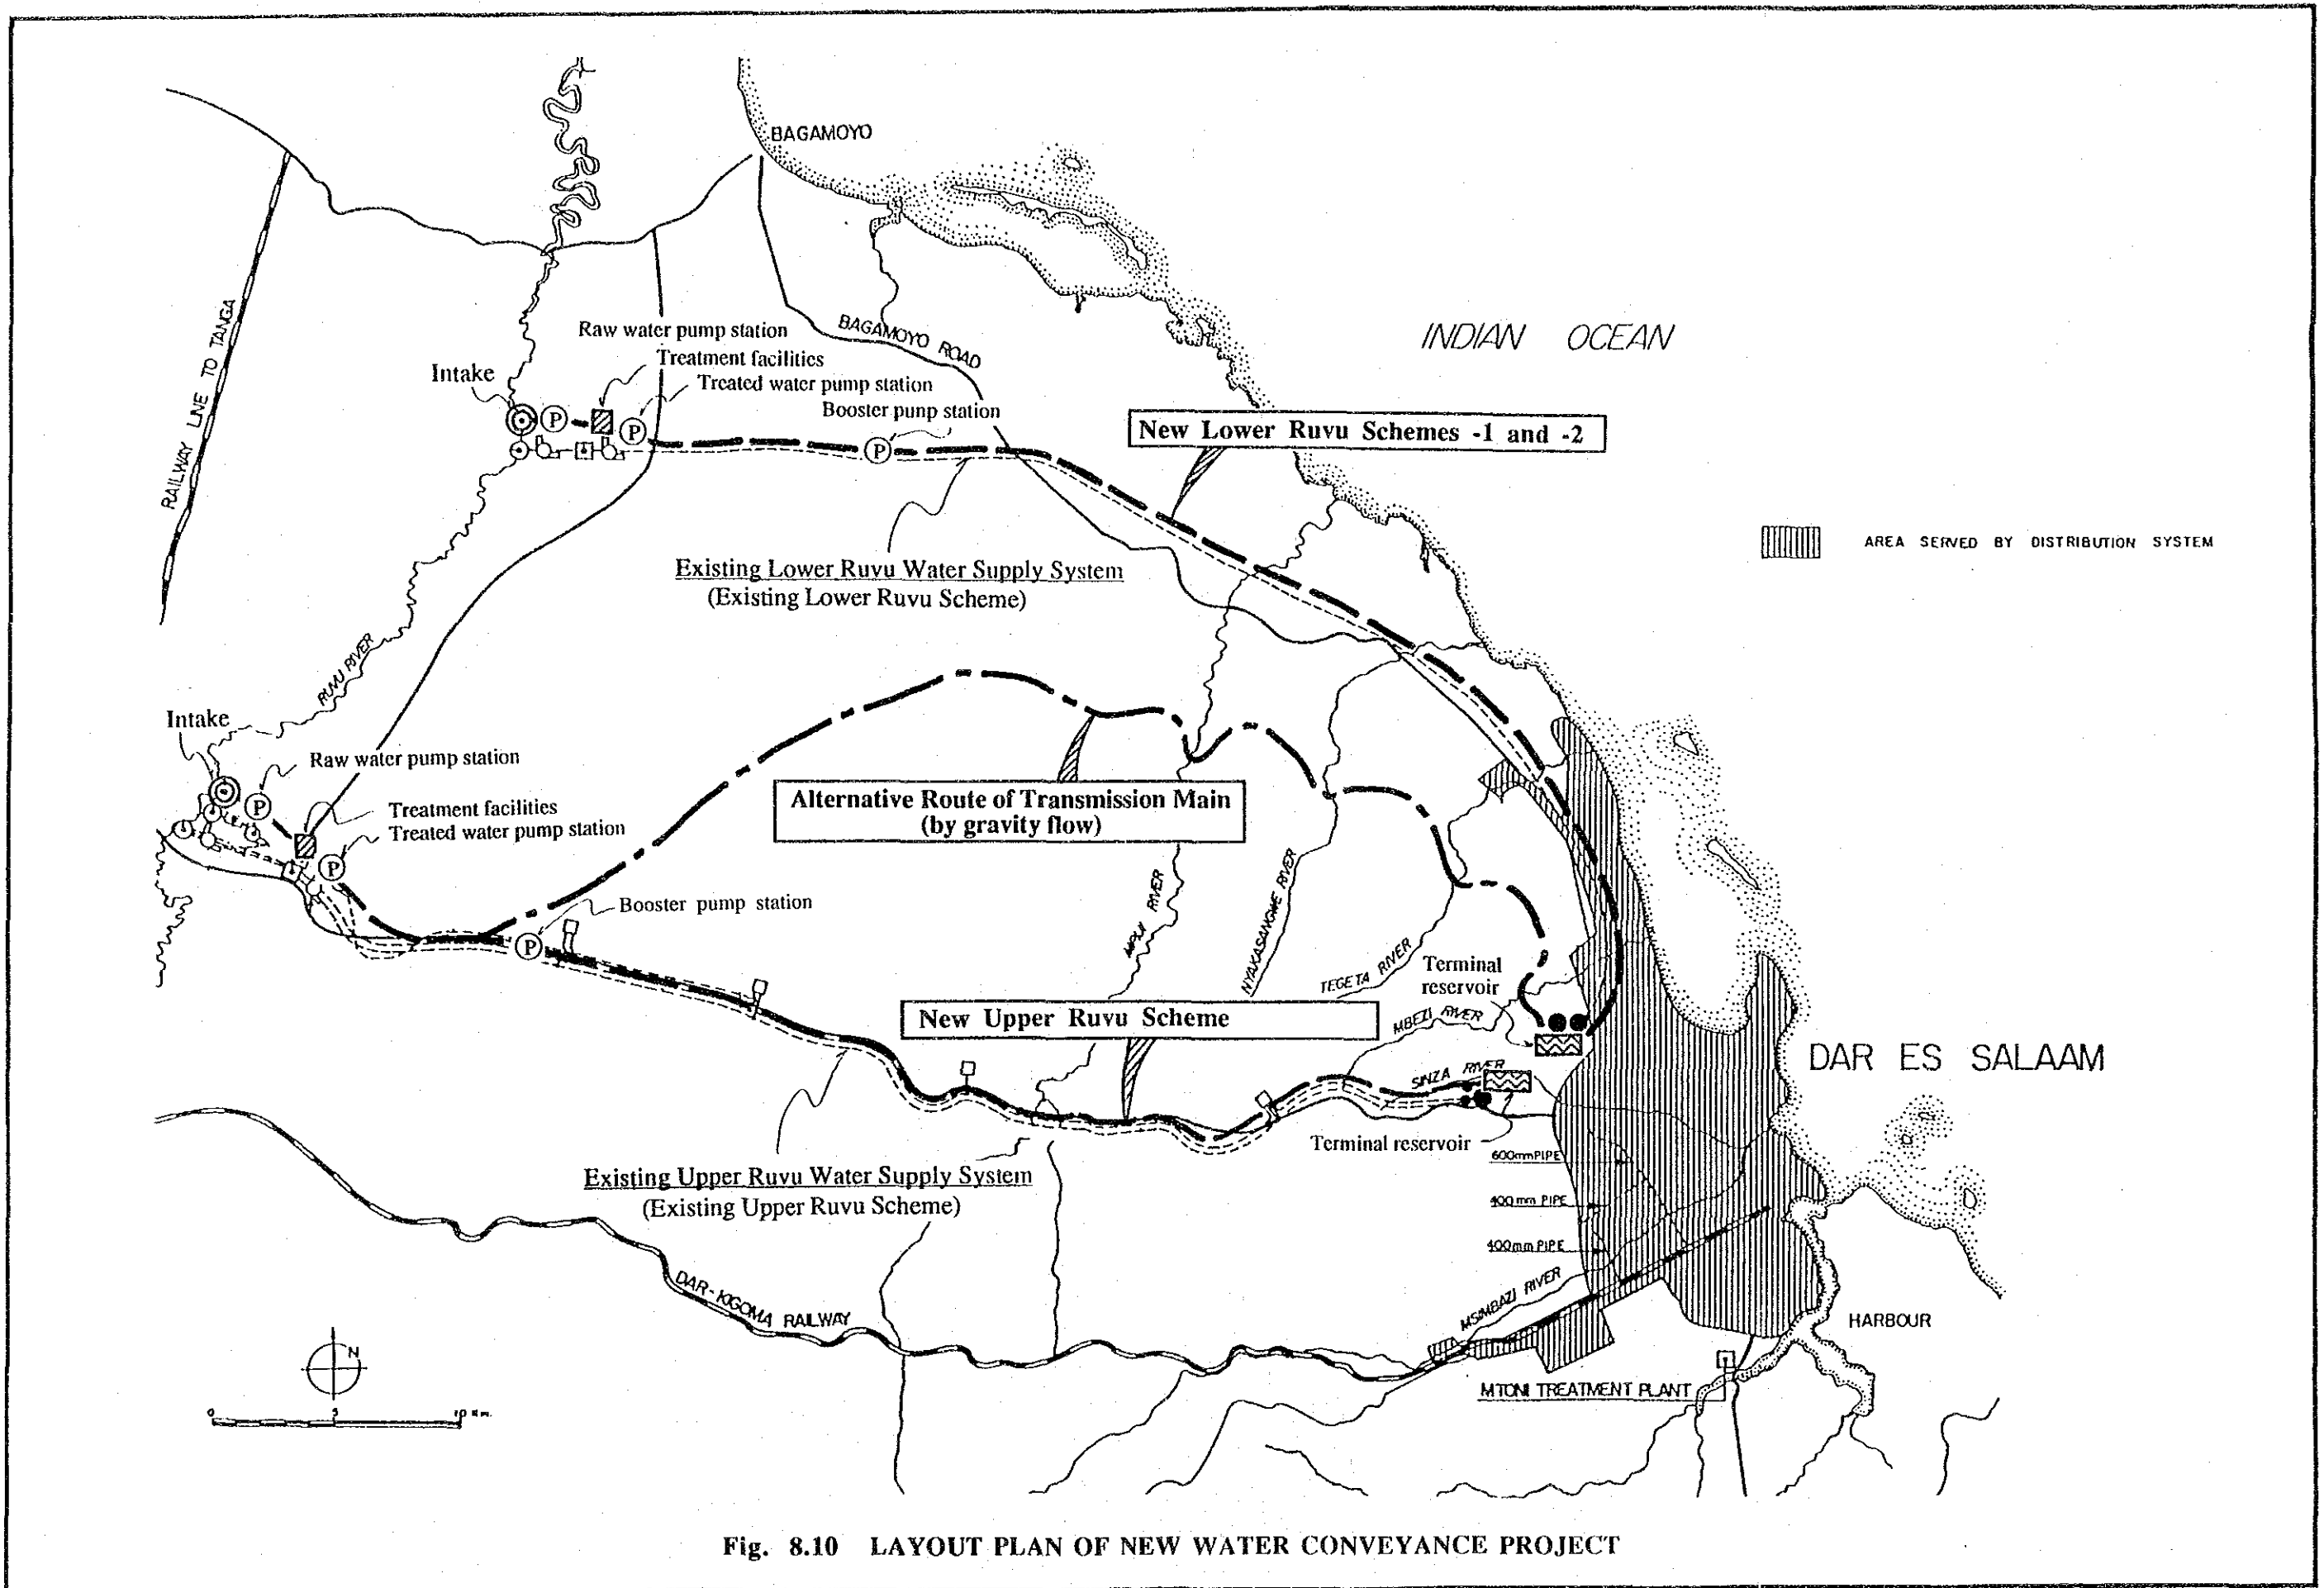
LAYOUT PLAN OF NEW WATER CONVEYANCE PROJECT
